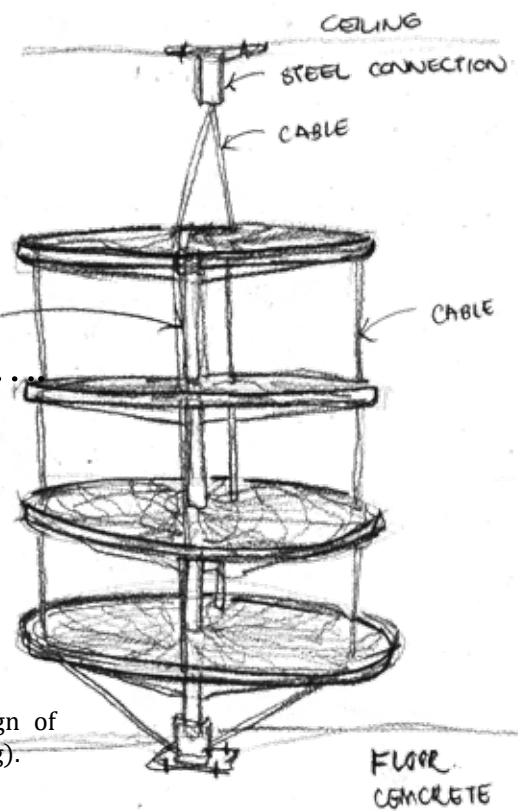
Phase 02: Detailed plan of silkworm pod with perspective (Caldeira, 2019: drawing).
